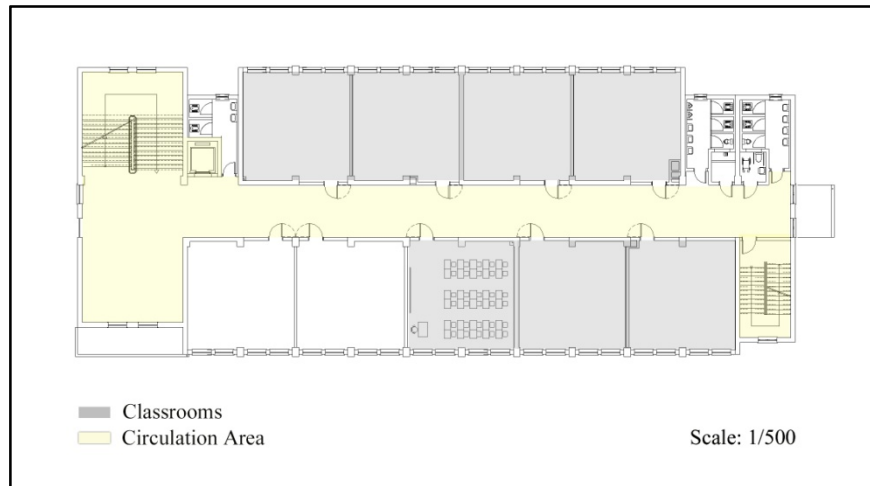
Typified floor plan of MEB 10025R-480 Type Elementary School
